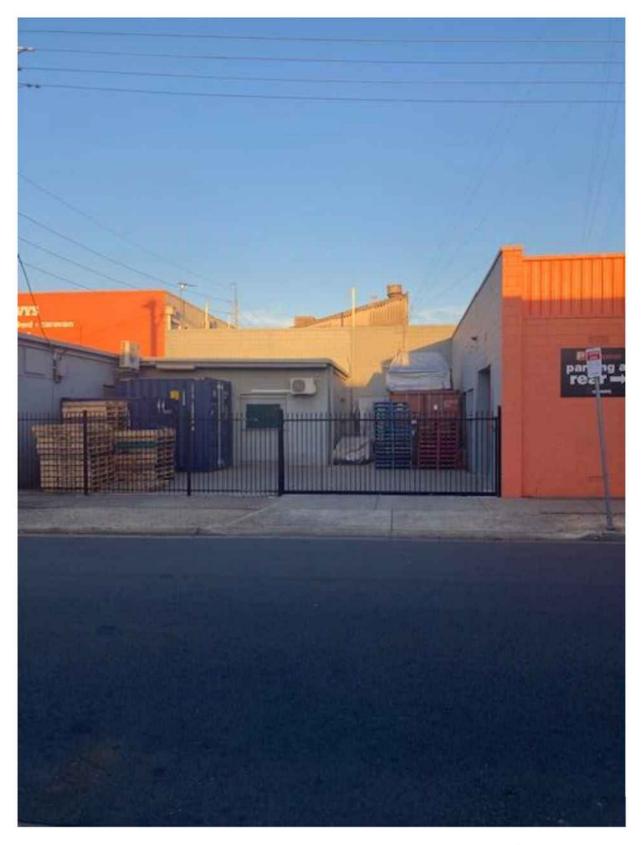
No. 90-94 Richmond Road existing outdoor storage / service area
